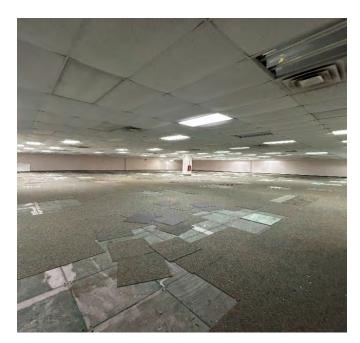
(Left) – Open concept floor plan of the old Data Center.
